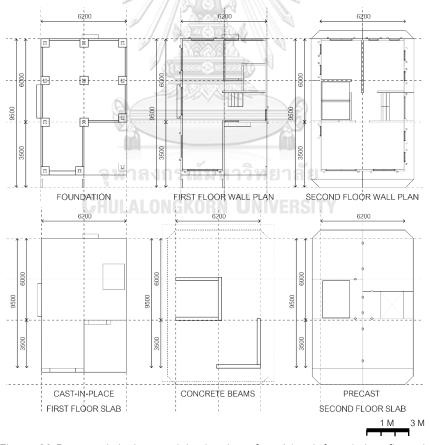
Proposed design module drawing of an A1 unit foundation, floor slabs and precast concrete wall plan.
